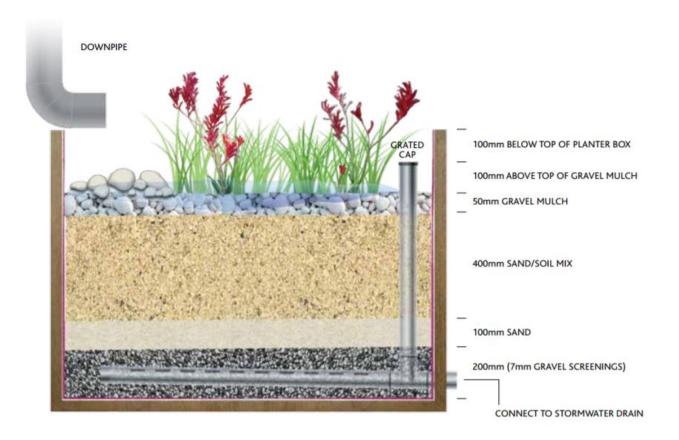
Example cross-sectional view of proposed planter box raingardens (Source: Melbourne Water²)
